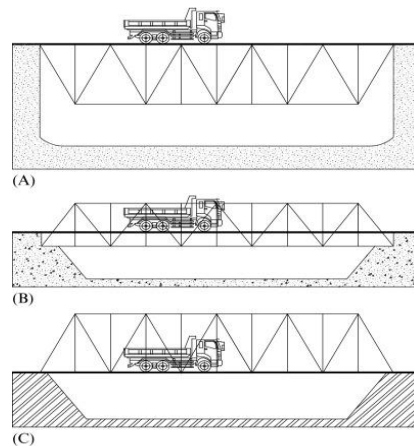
Truss types according to deck location. (A) Deck truss. (B) Half-through truss. (C) Through truss (Weiwei L., 2017)
